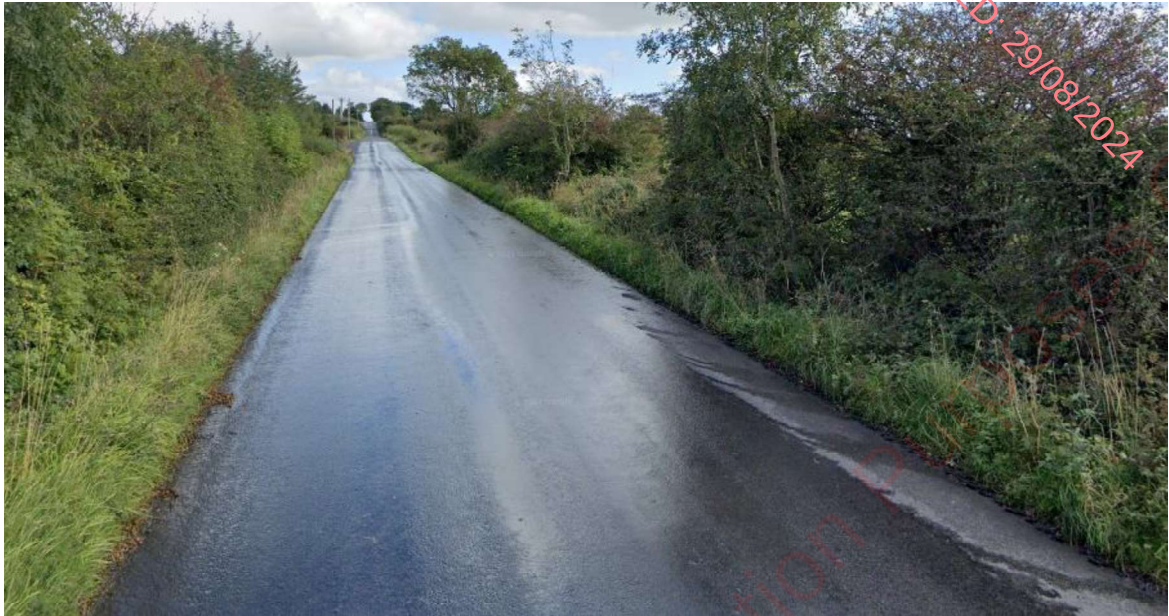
Section D Local Road through Mullafarry Townlands – Typical Road Conditions and Formation
